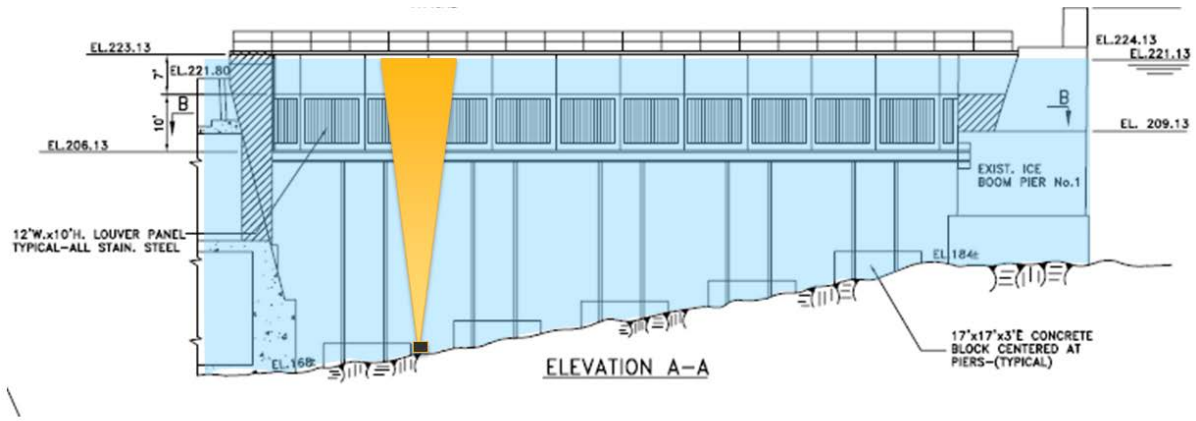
Figure B. Side view of fish diversion boom and louver. An upward-looking 15° 420-kHz split-beam transducer will monitor surface-oriented fish passing through the acoustic beam (orange). The half-power beam width at the 6 to 10-ft depth layer of fish pipe opening is about 11 to 12 feet wide.
